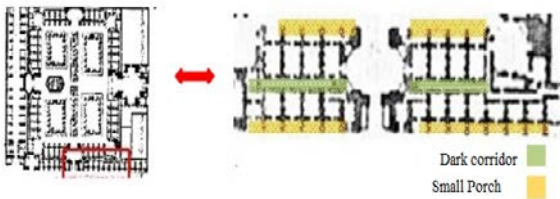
Showing the hallways on the first floor plan of Madarshah school (Source: the writer)
